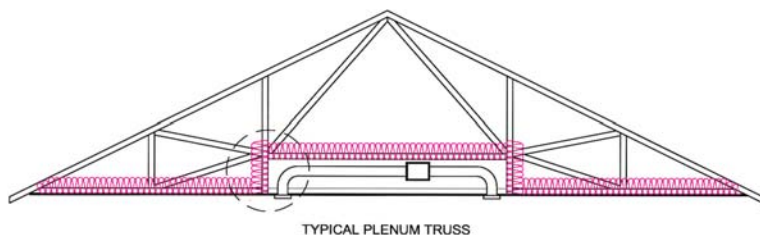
Insulation detail shown installed over ductwork in Mercedes' recessed trusses
